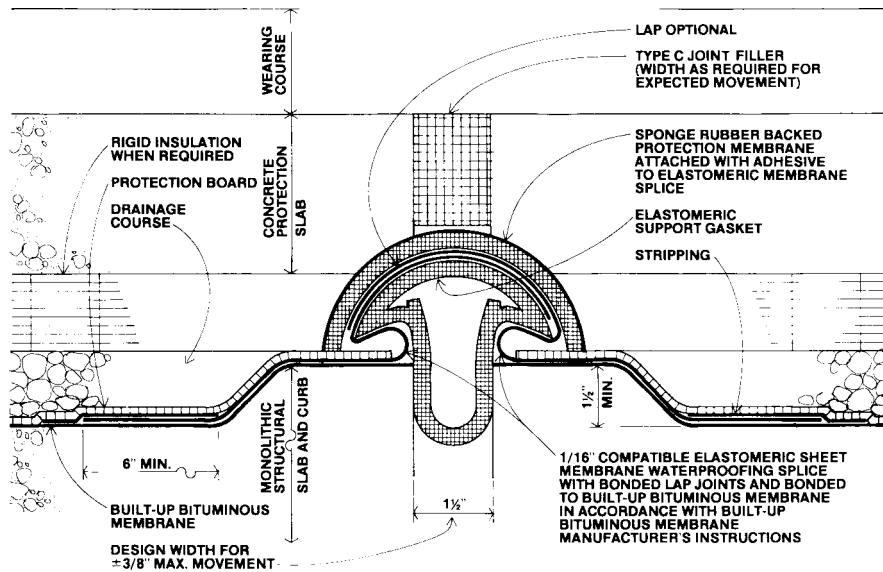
Water Shed Concept Expansion Joint (see 9.8.7.2)
